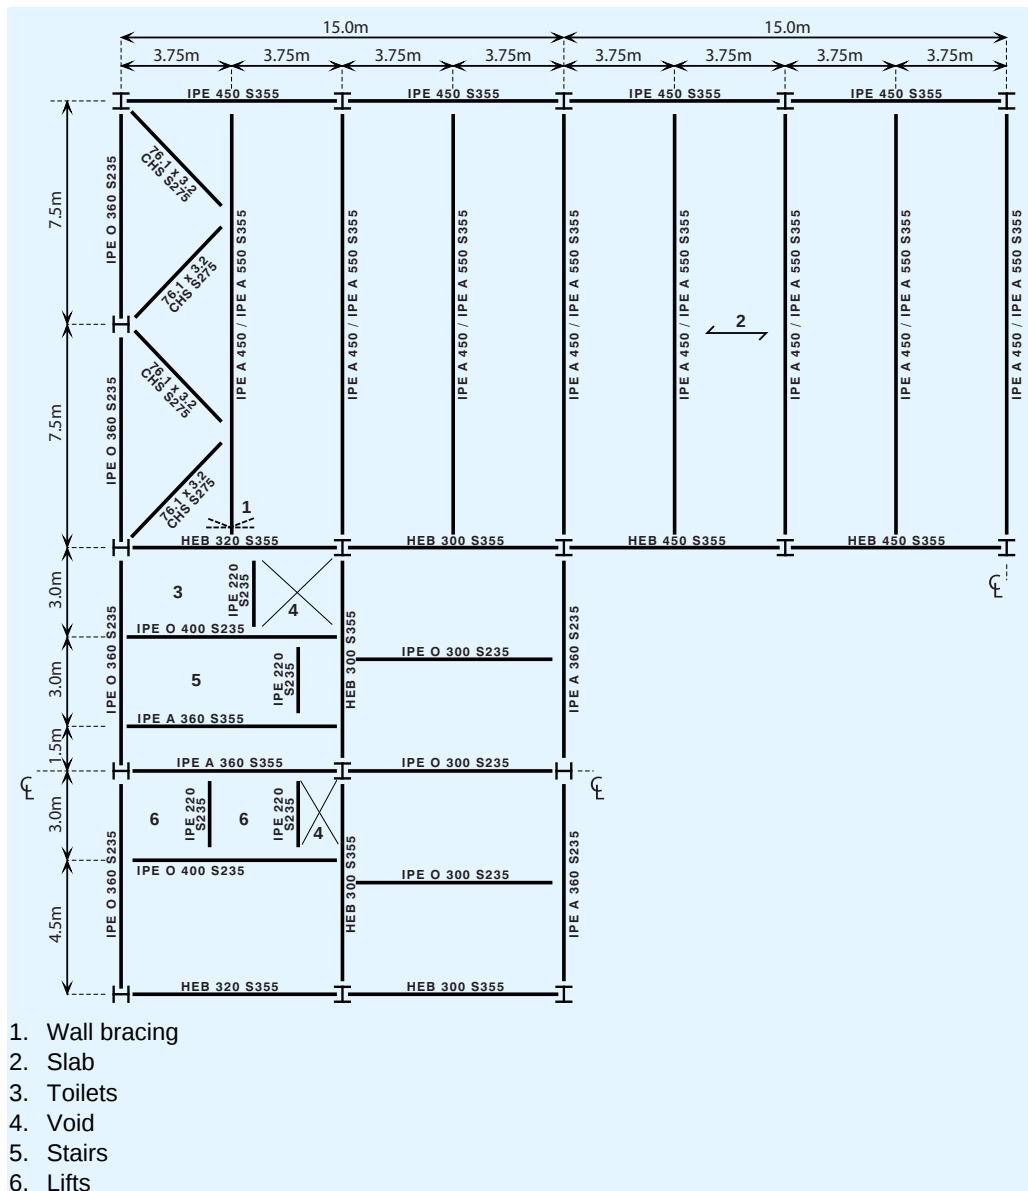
Cellular beams (long-span secondary beams) – example of steelwork arrangement at the corner of a 8-storey building with an atrium
